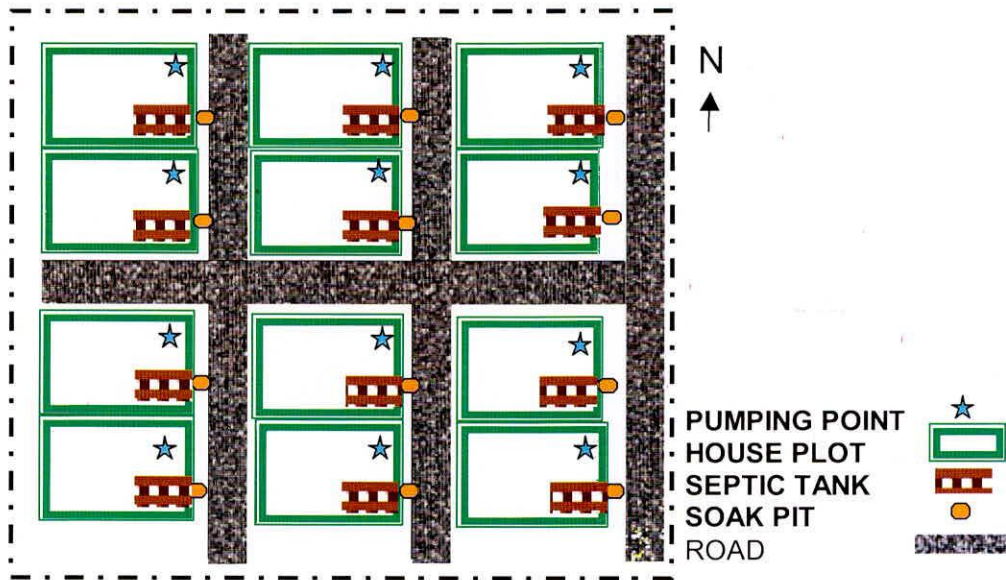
Plan showing house plots in a town with septic tank-soak pit
